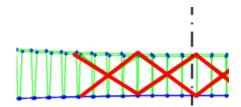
Vertical Bracing Pattern at Center of 80 m Span Footbridge
